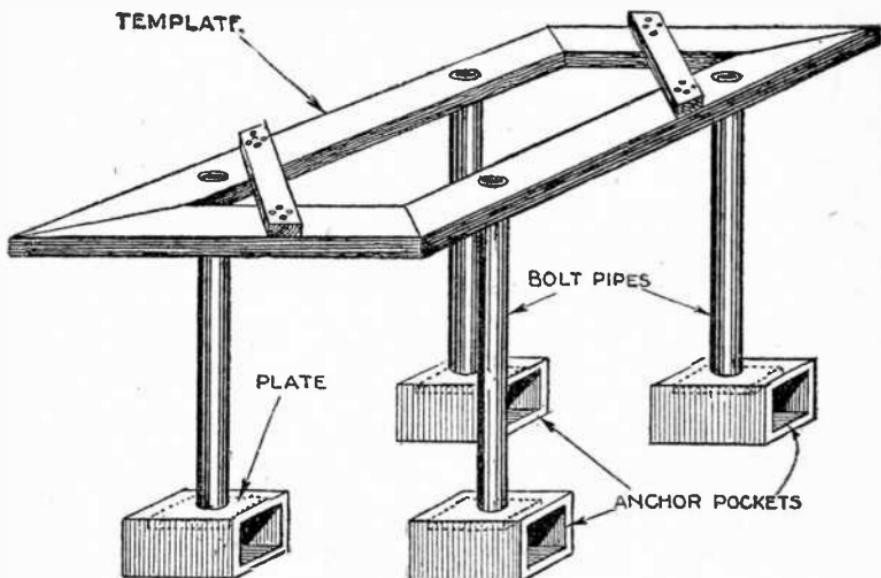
,936.—View showing template for locating anchor bolt centers, pipes through which the bolts pass, and bolt boxes at lower end of bolts. The completed foundation is shown in fig. 3,937, with template removed. The template is made of plain boards upon which the center lines are drawn, and bolt center located. Holes are bored at the bolt centers to permit insertion of the pipes as shown.
